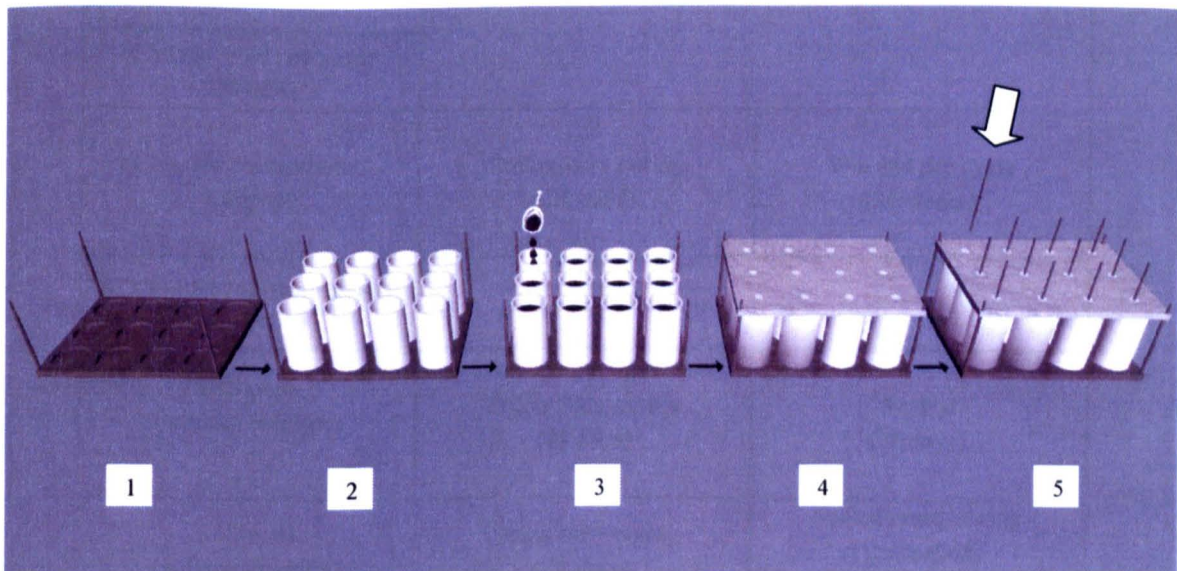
Process of casting reinforced concrete specimens; 1) base of jig that supports the moulds, 2) base with moulds in place, 3) placing of concrete, 4) fitting of lid to secure assembly, and 5) insertion of steel rods to pre-determined depth
